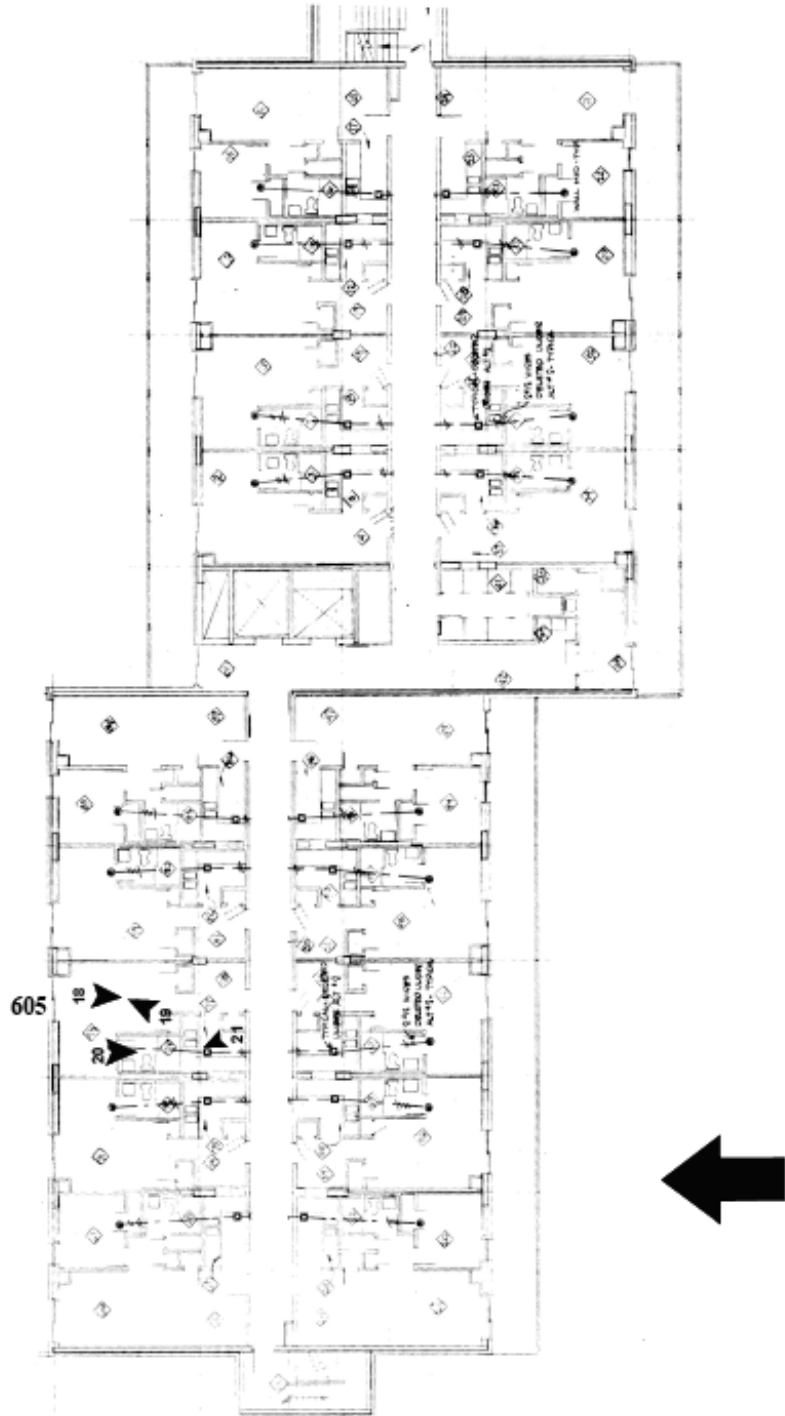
Interior First Floor Photo Plan. Not to Scale.
